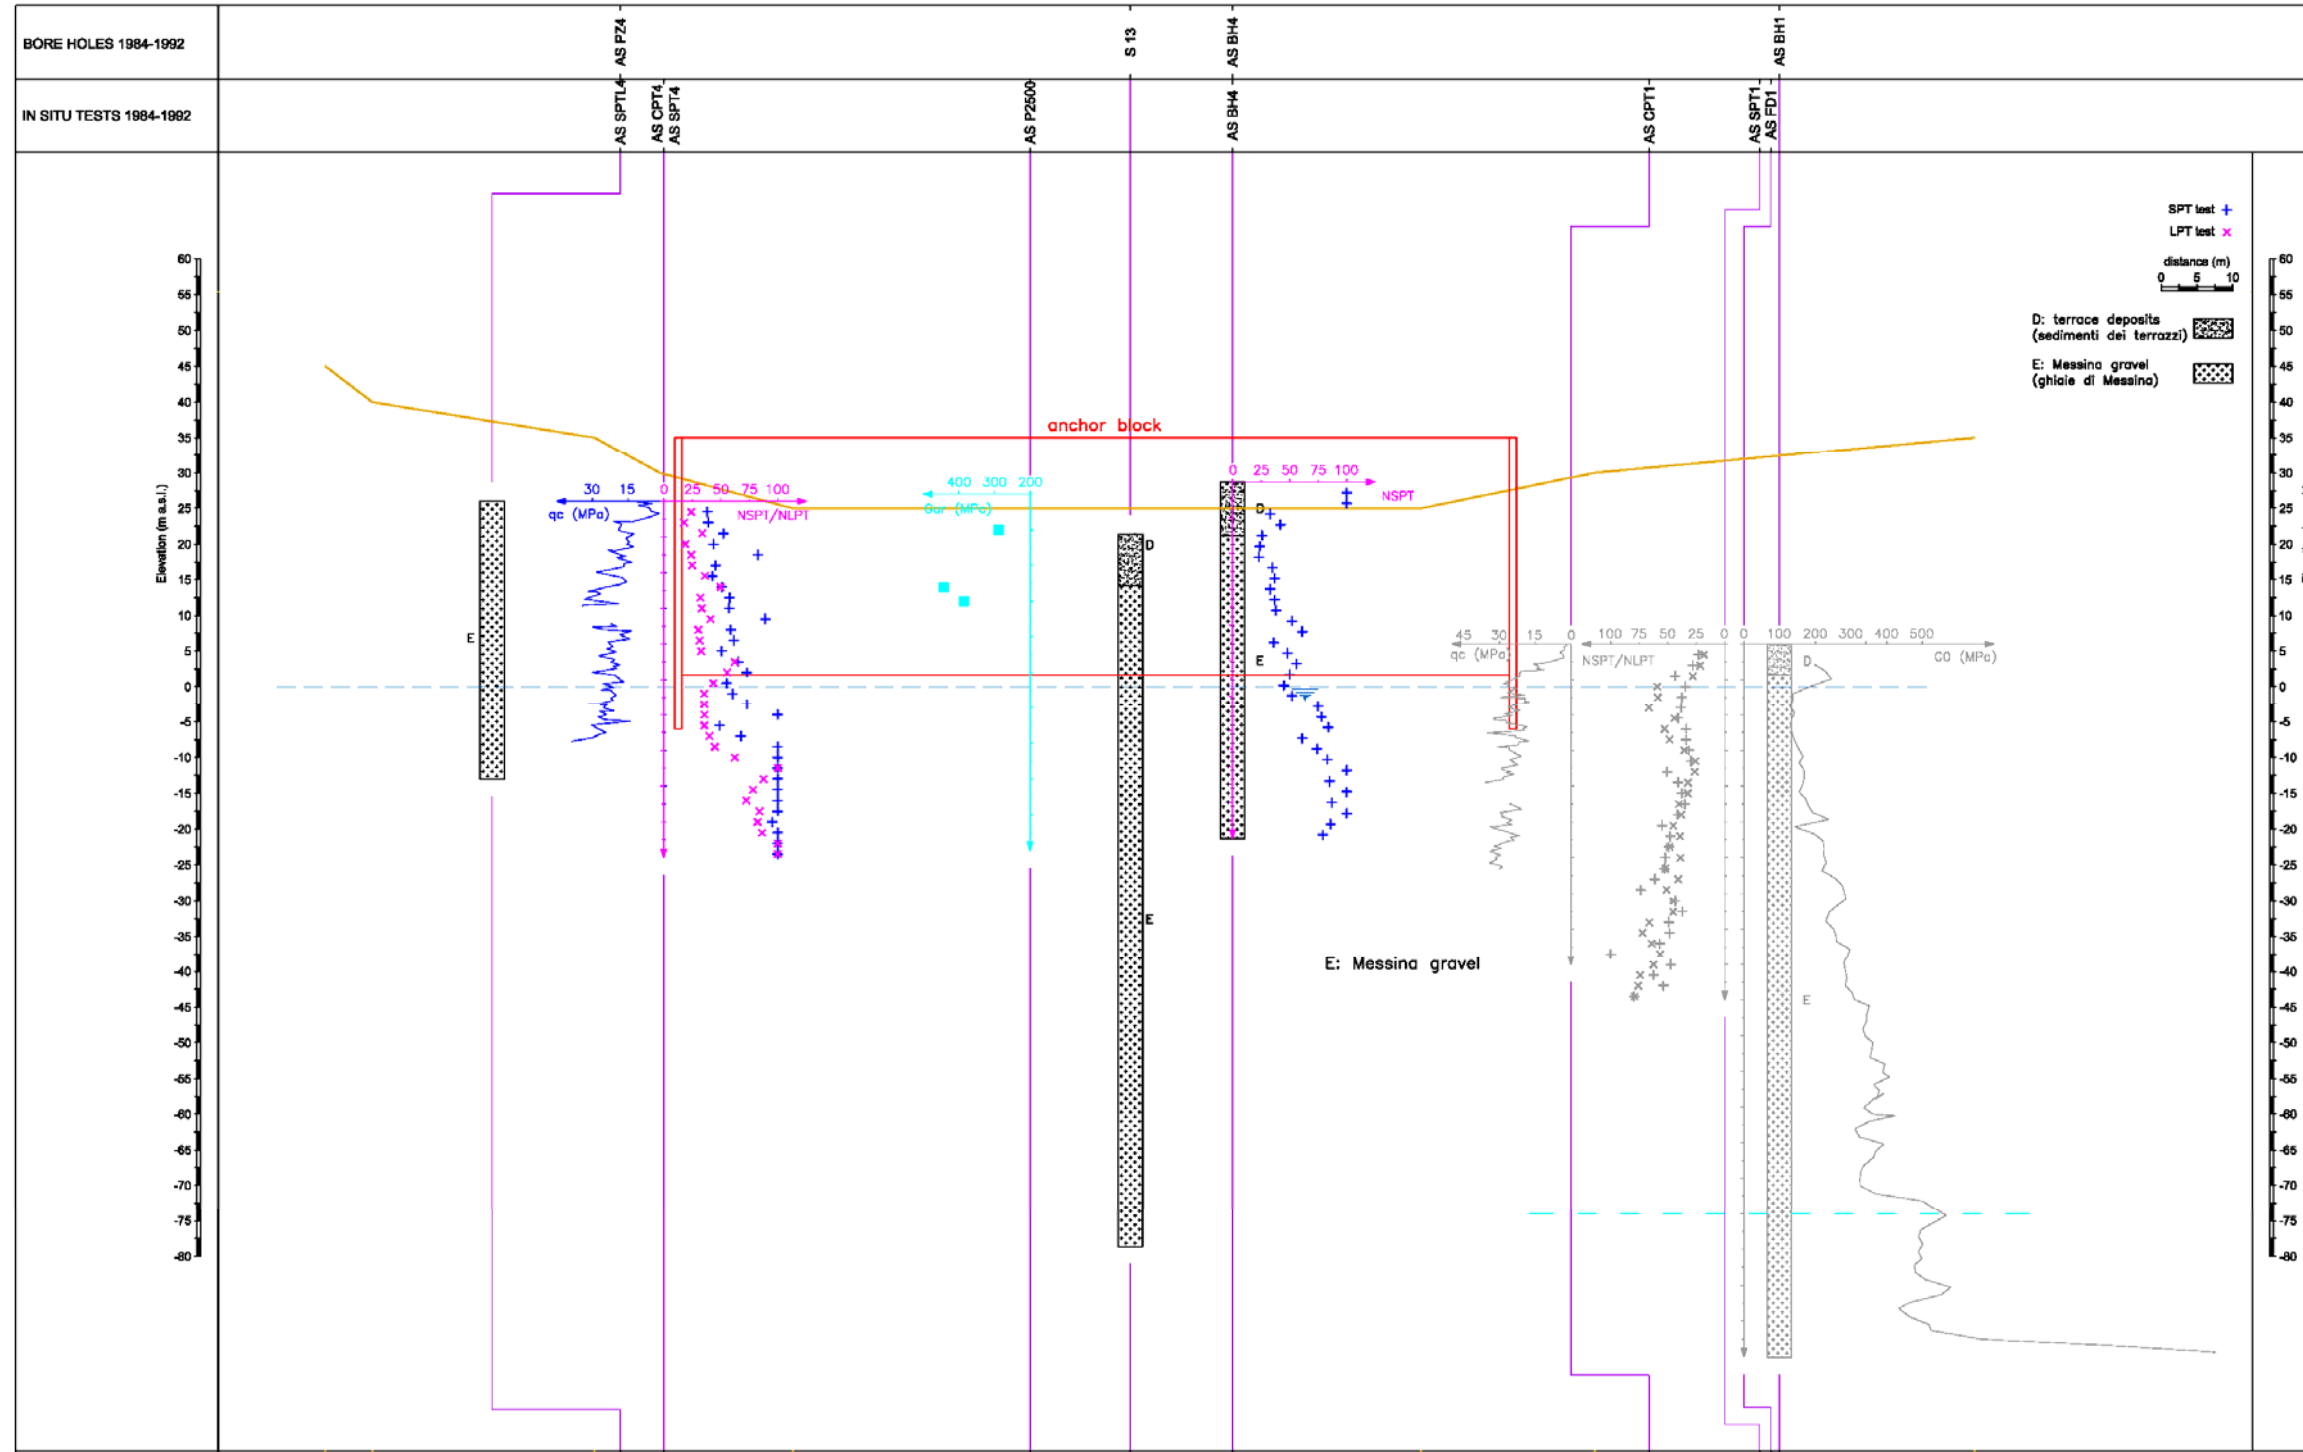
Sicily Anchor Block, cross section (section No. 1)
